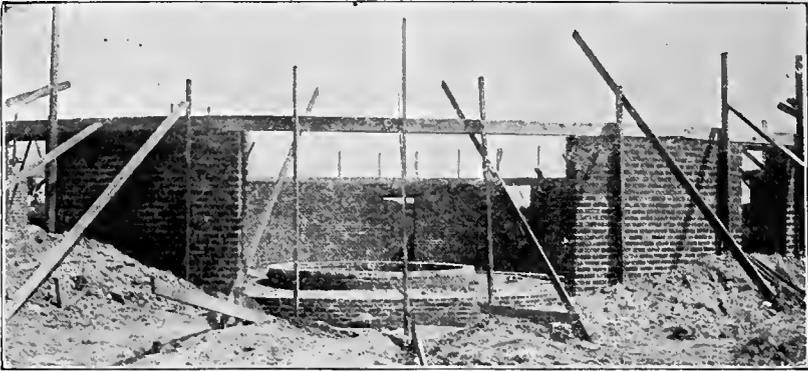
First-story Wall and Foundation for Silo, Feed Alley and Manger; Sill in place, ready for joists and studs.
